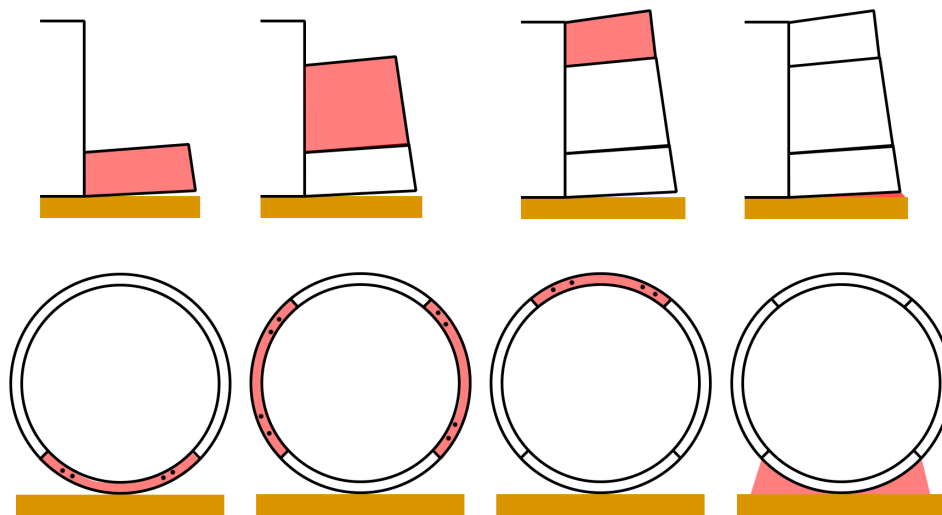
Construction process transition tube. Red parts indicate construction steps.
